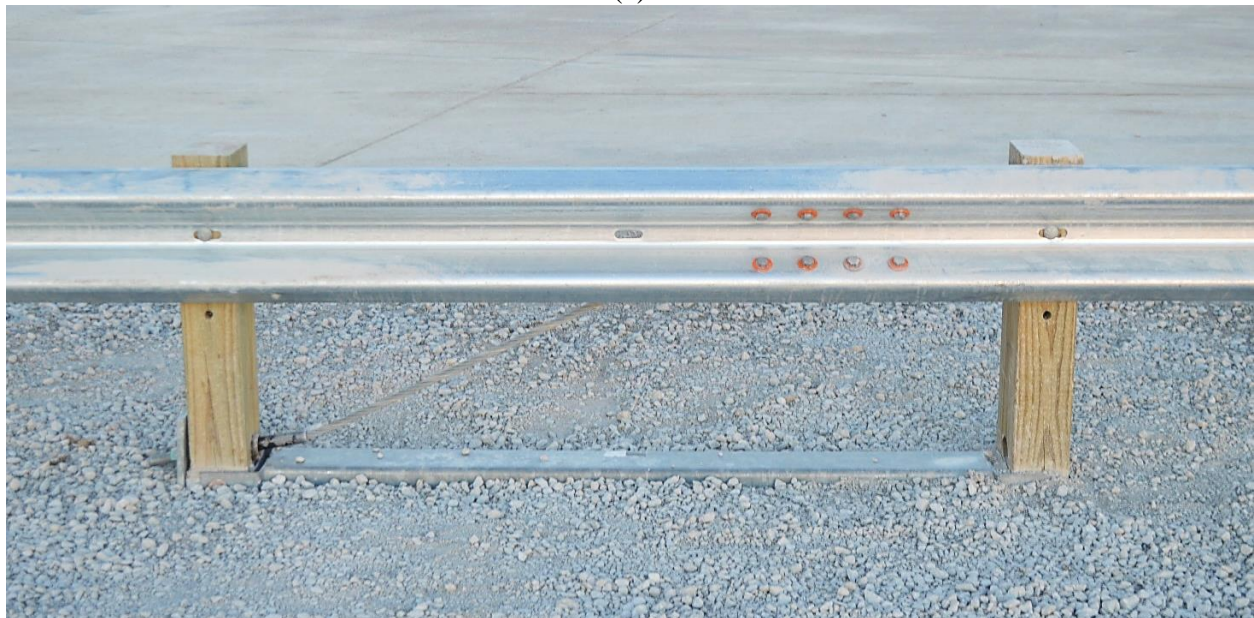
Damage to Post and Base Plate No. 21, Test No. CMGS-1
